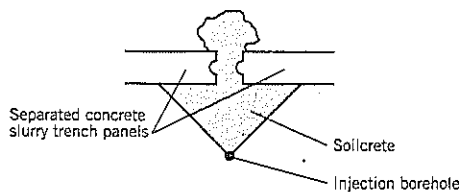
Jet grouting used to seal a separated joint in a concrete slurry trench wall.
